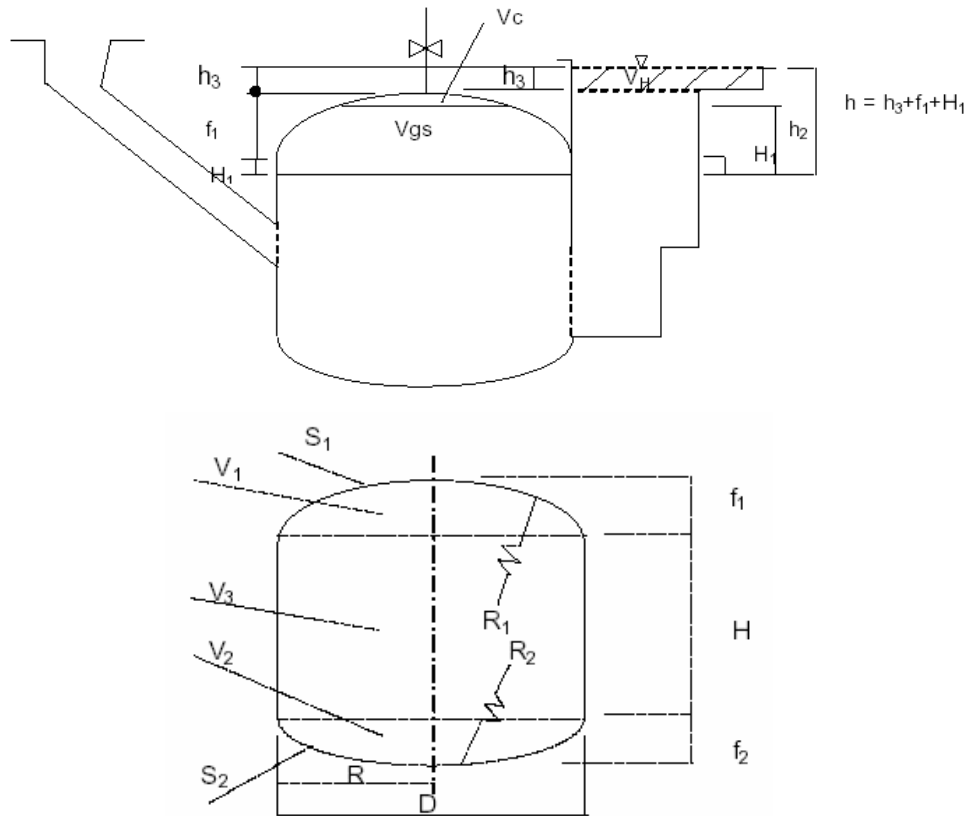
Fixed dome biogas plant, LGED model (LGED web site)
